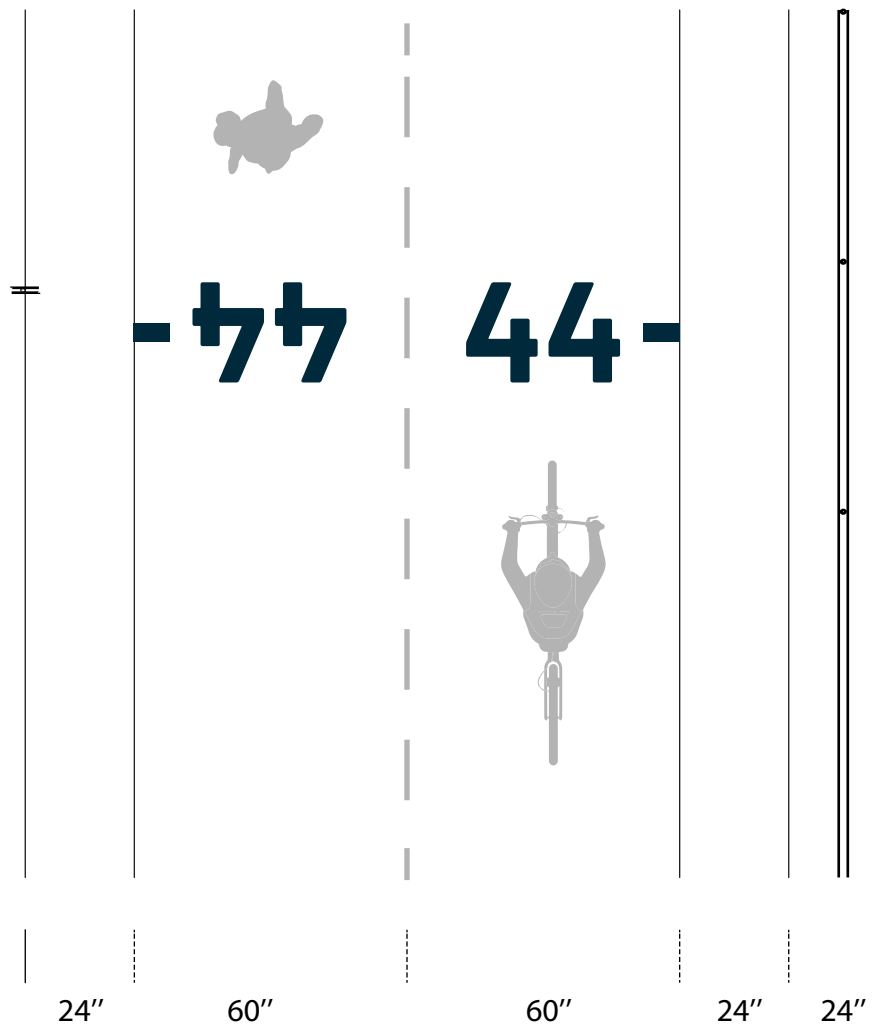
Pavement markings should be placed so that they face the direction of travel.
